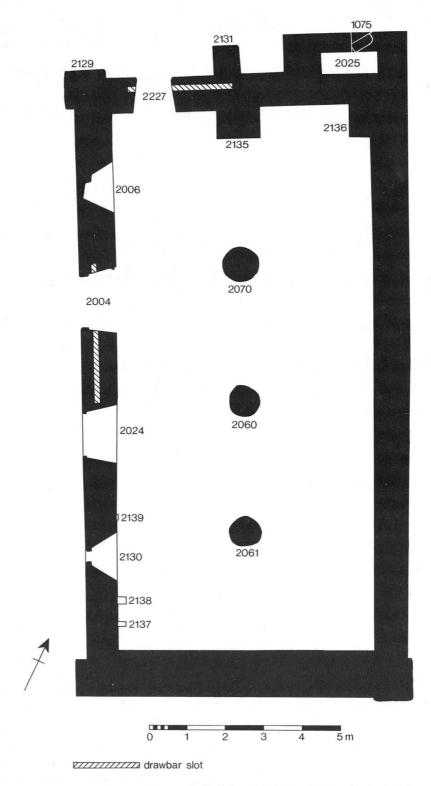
Phase III3 (centre). Building 2100. Block plan. Scale 1:100.
